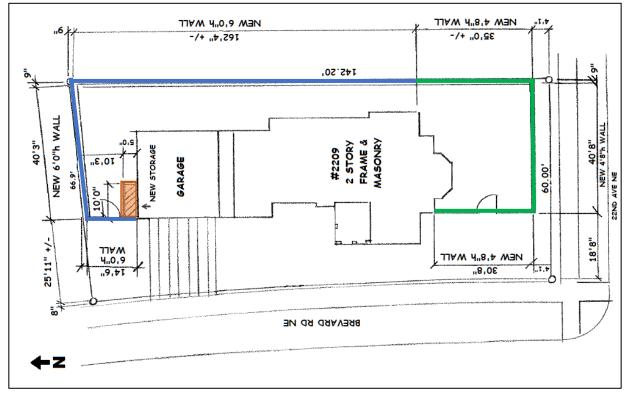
Site plan showing the location of the proposed perimeter wall. The green line indicates the 4 foot, 8inch-tall wall. The blue line indicates the 6-foot-tall wall, and the orange box indicates the proposed storage shed on the rear elevation of the garage.
